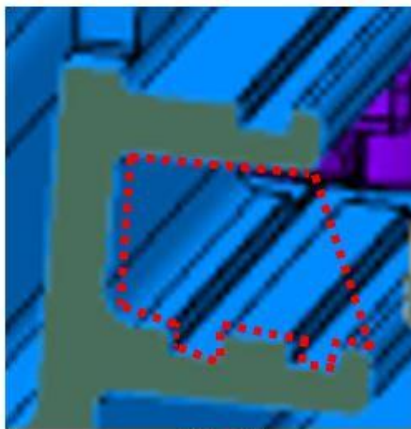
Cut the butyl adhesive sealing cord to approx. 20mm.
